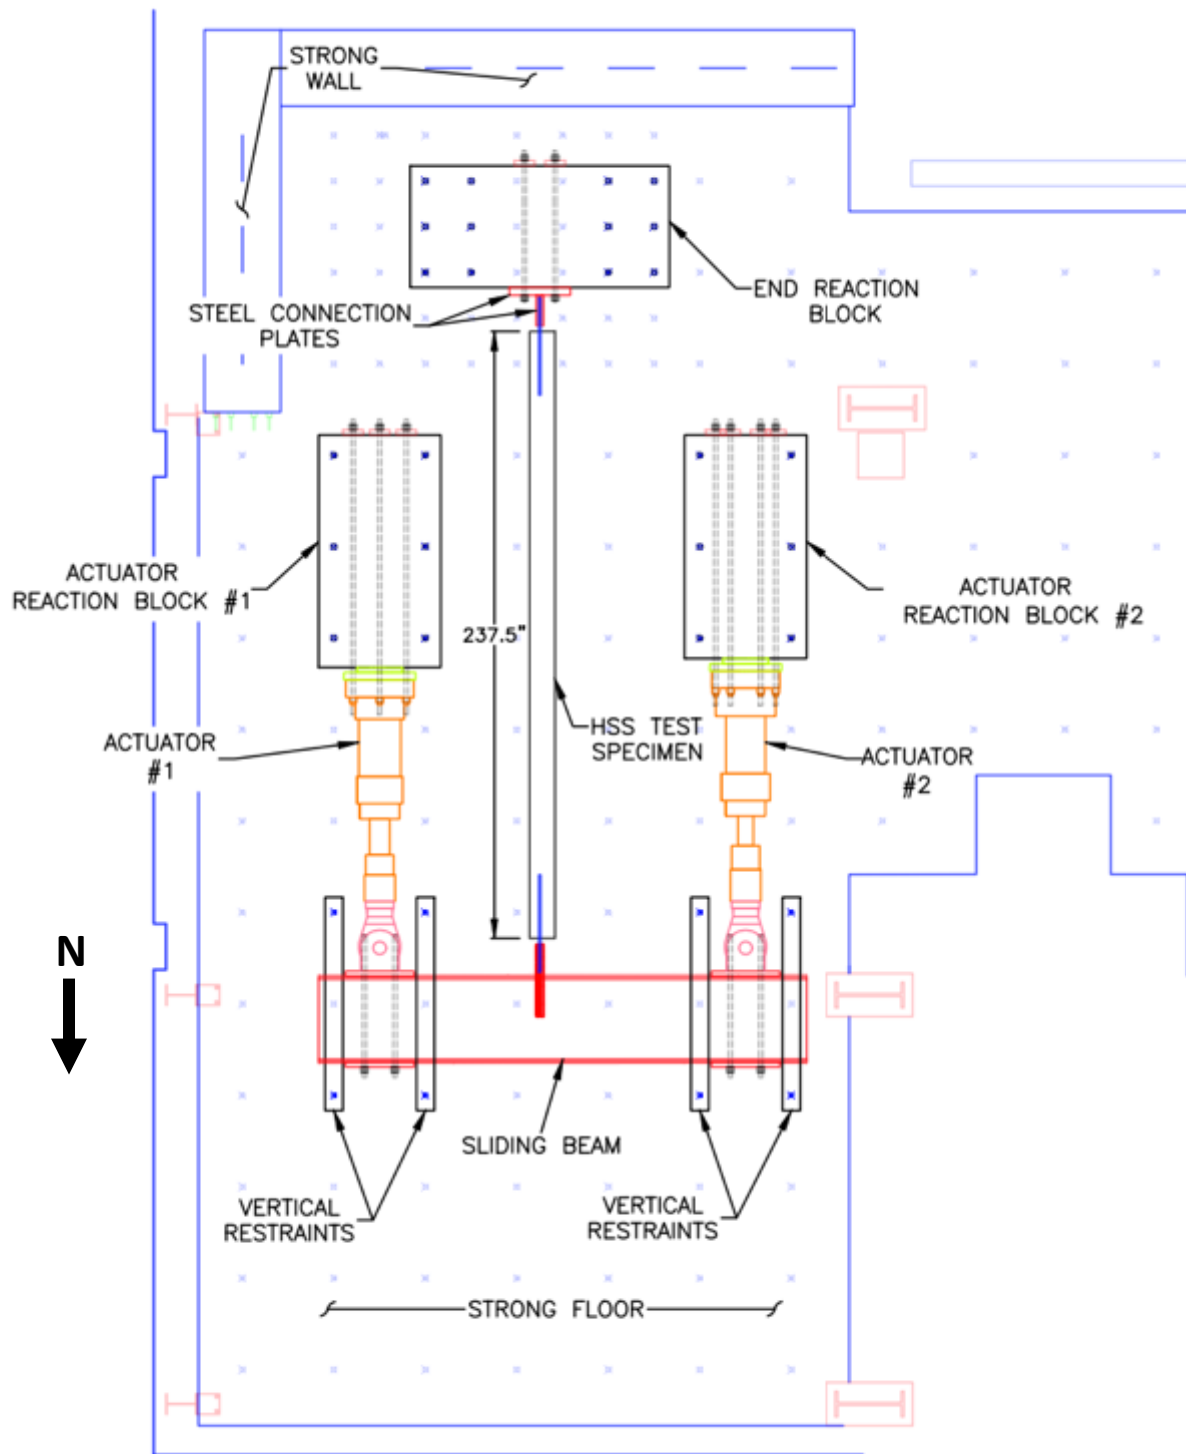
Overview of Test Frame for 237.5" Specimens
